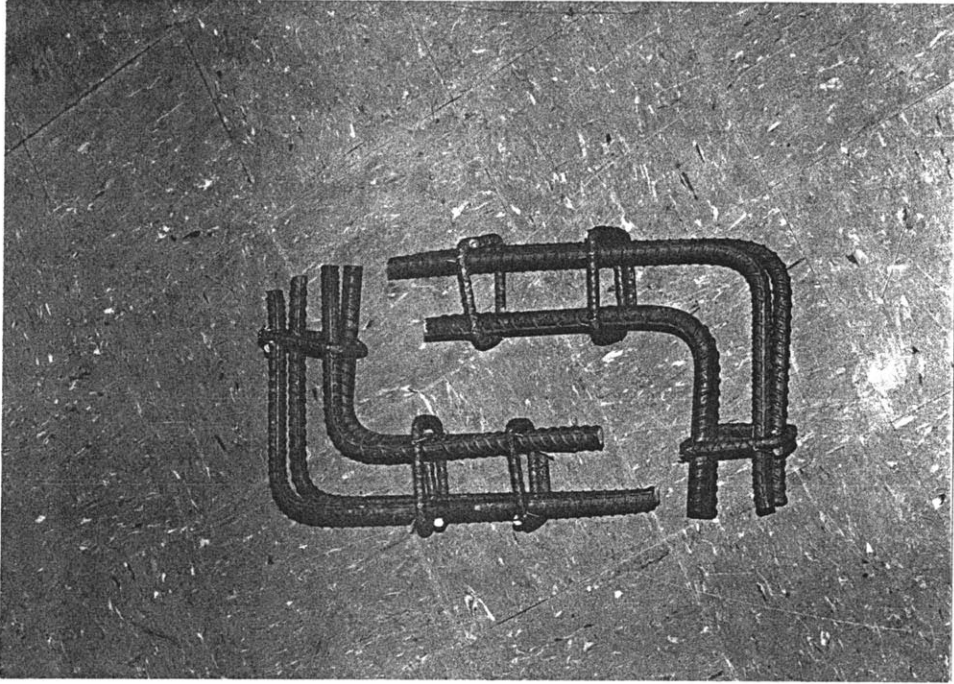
Steel reinforcement for push-off specimens with no steel stirrups crossing the shear plane.
